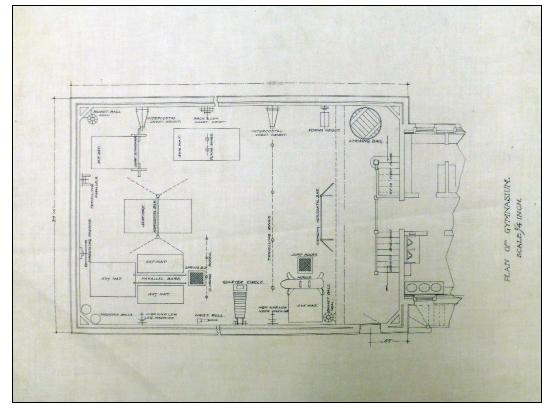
Floor plan of a typical gymnasium in a post exchange of the same plan as Brayton Hall (21115).
